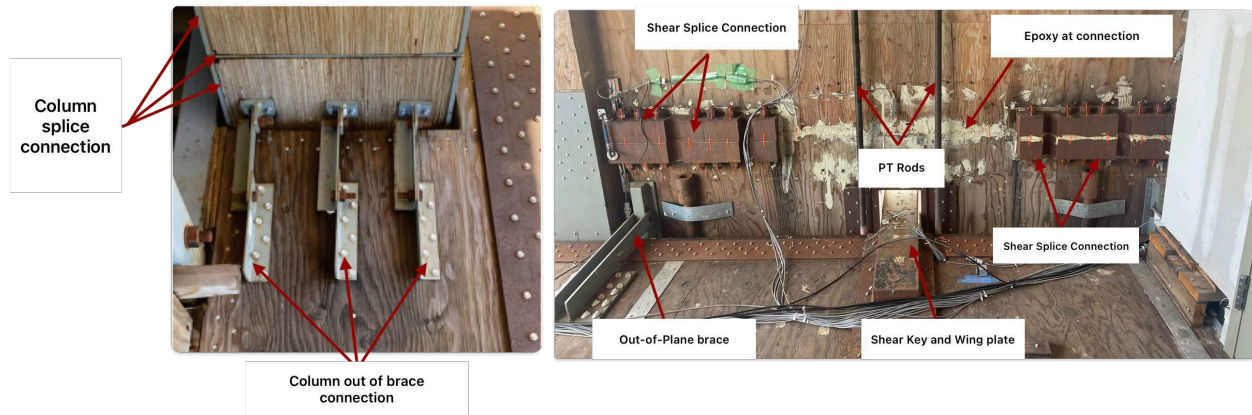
Column Out of Brace Connection and Wall Splice Connection Detail
